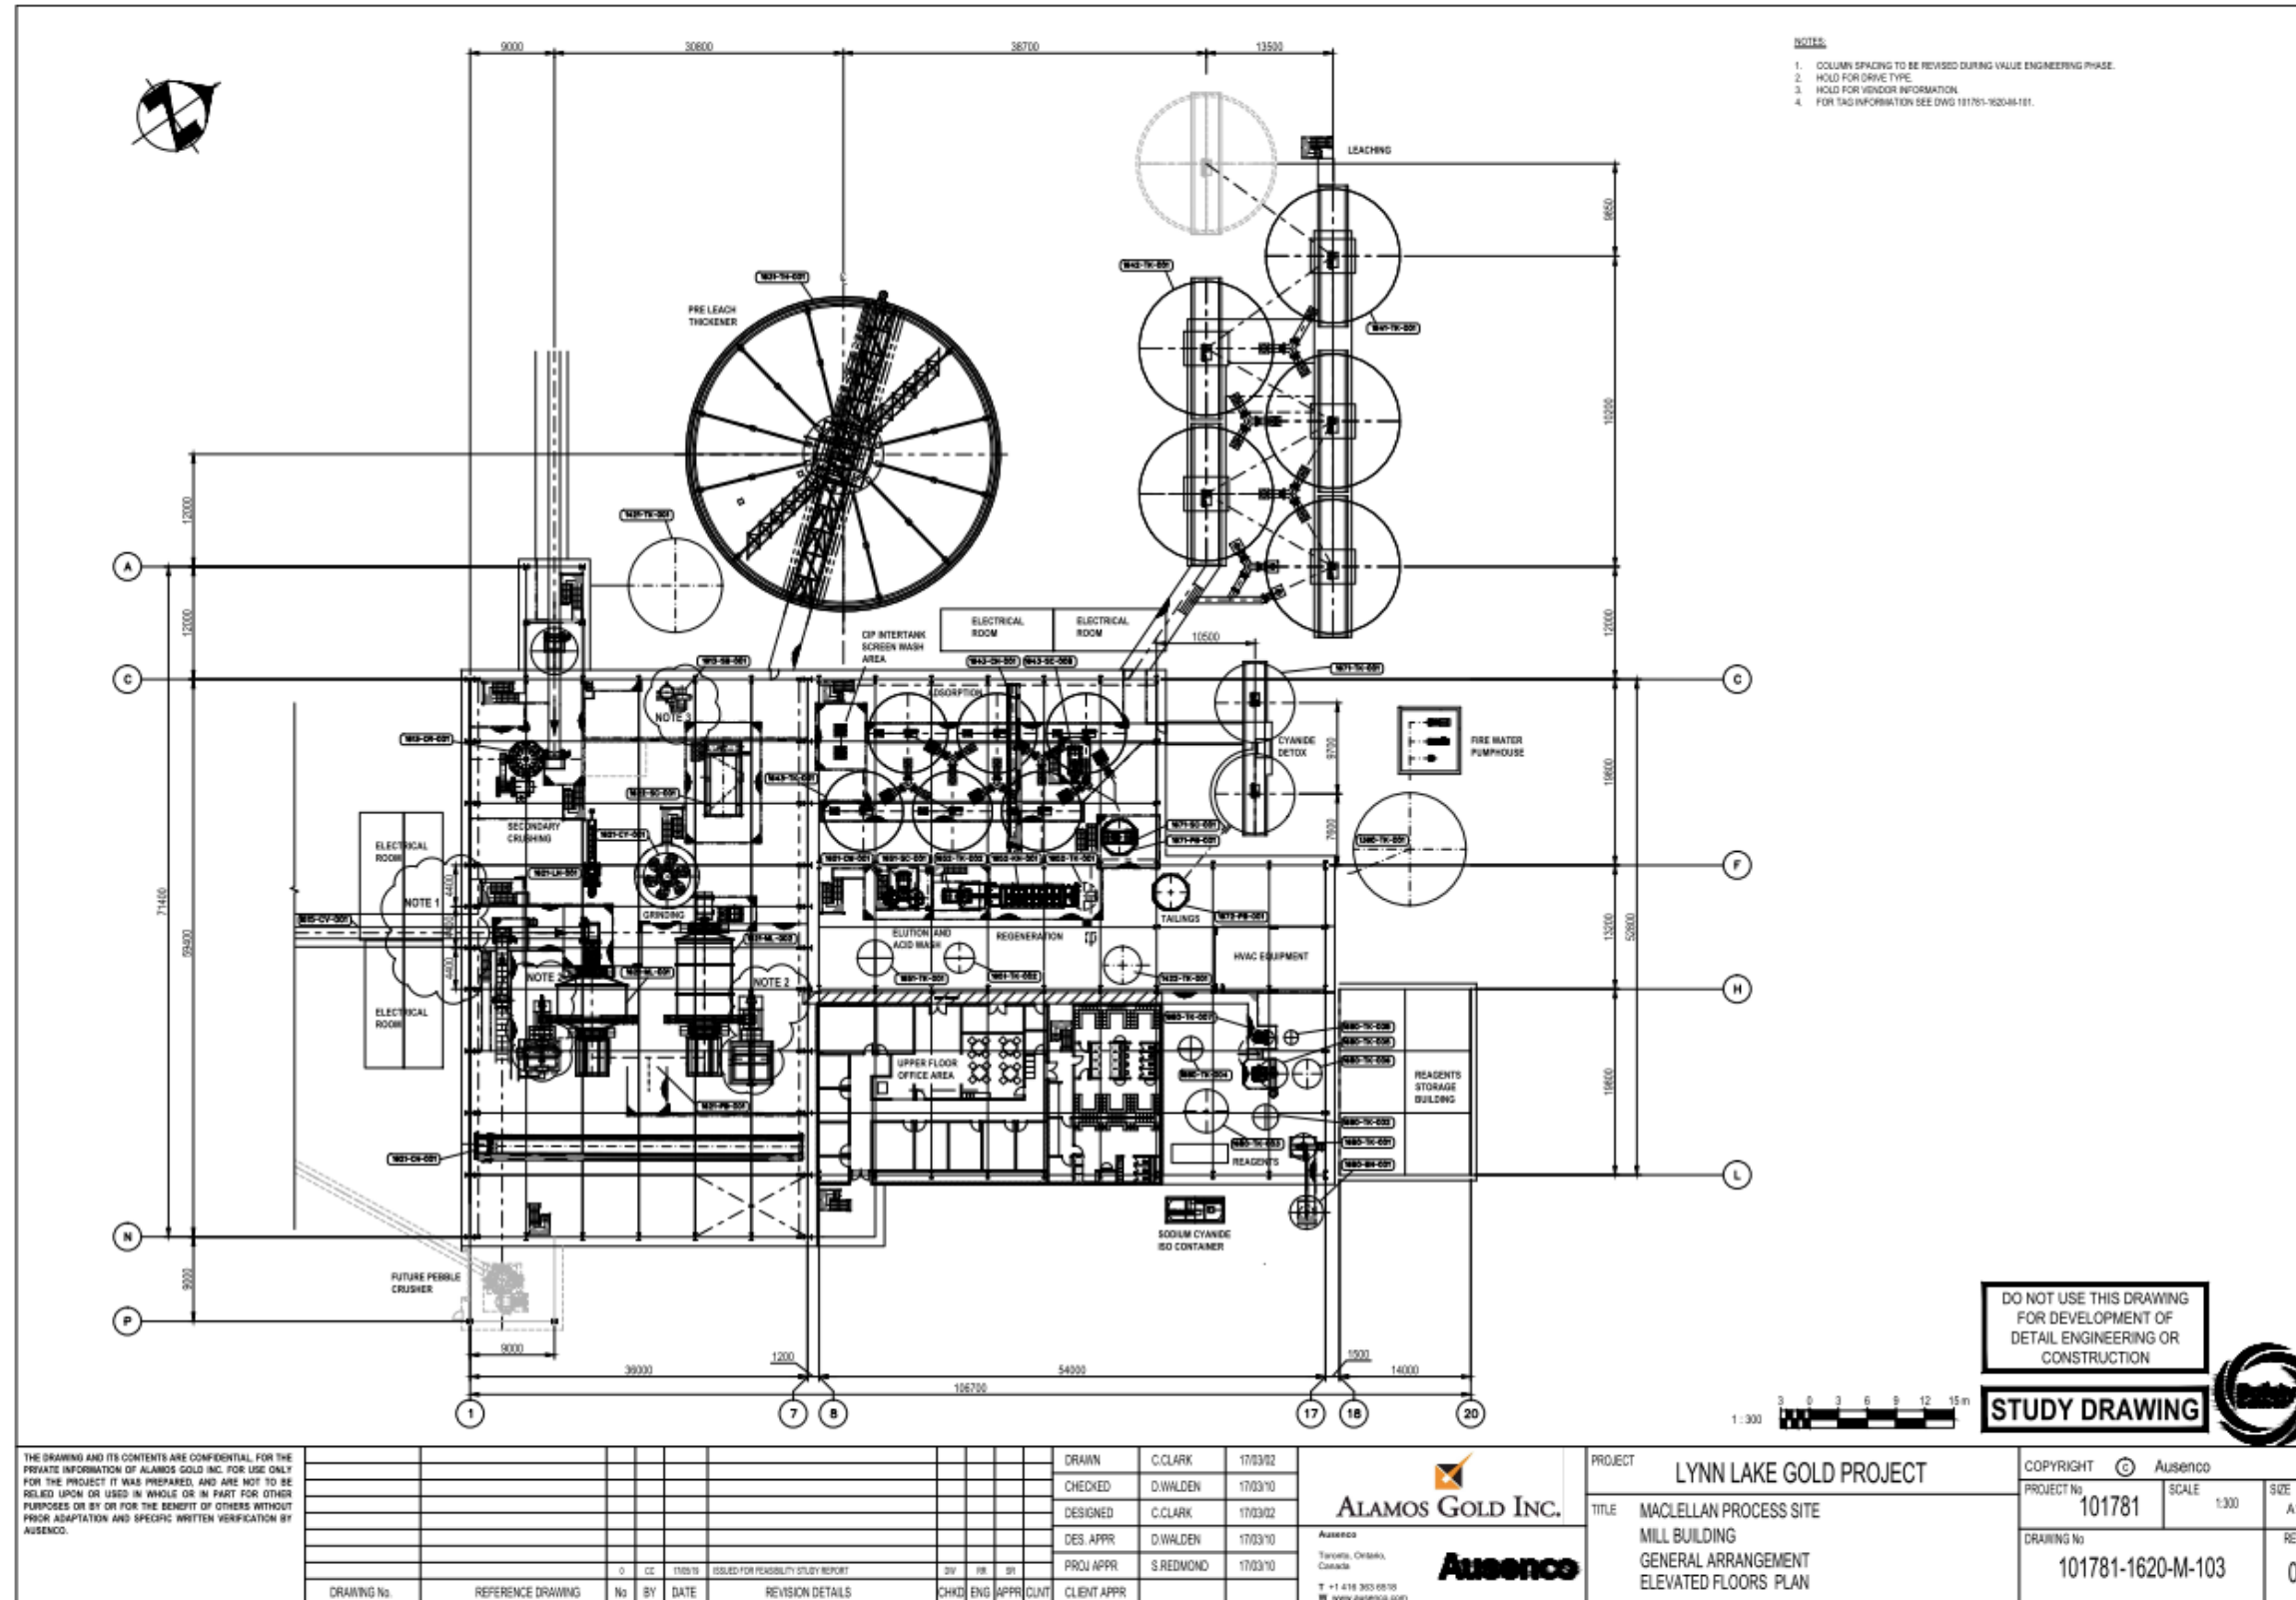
MacLellan Mill Building General Arrangement, Elevated Floors Plan
